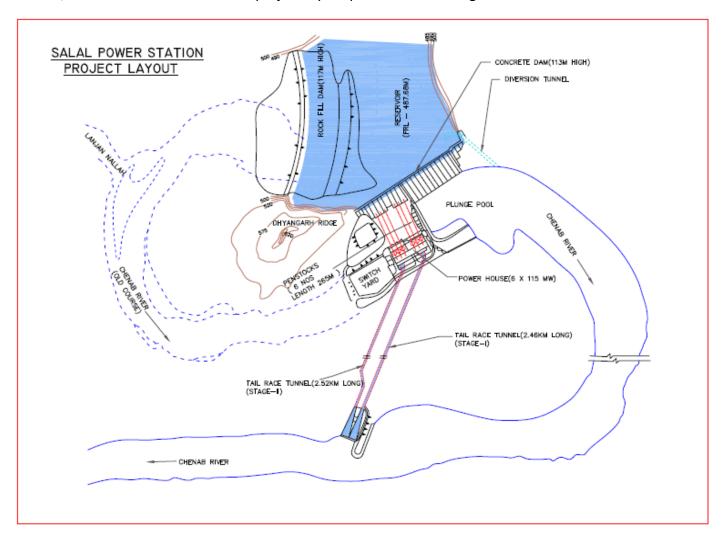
Project Layout Plan of Salal Power Station, UT of J&K
